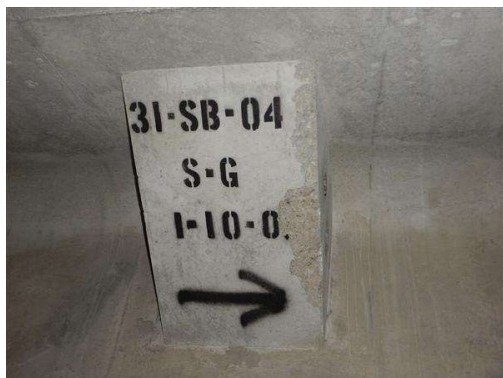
Typical cracking and spalling on future external PT blocks
